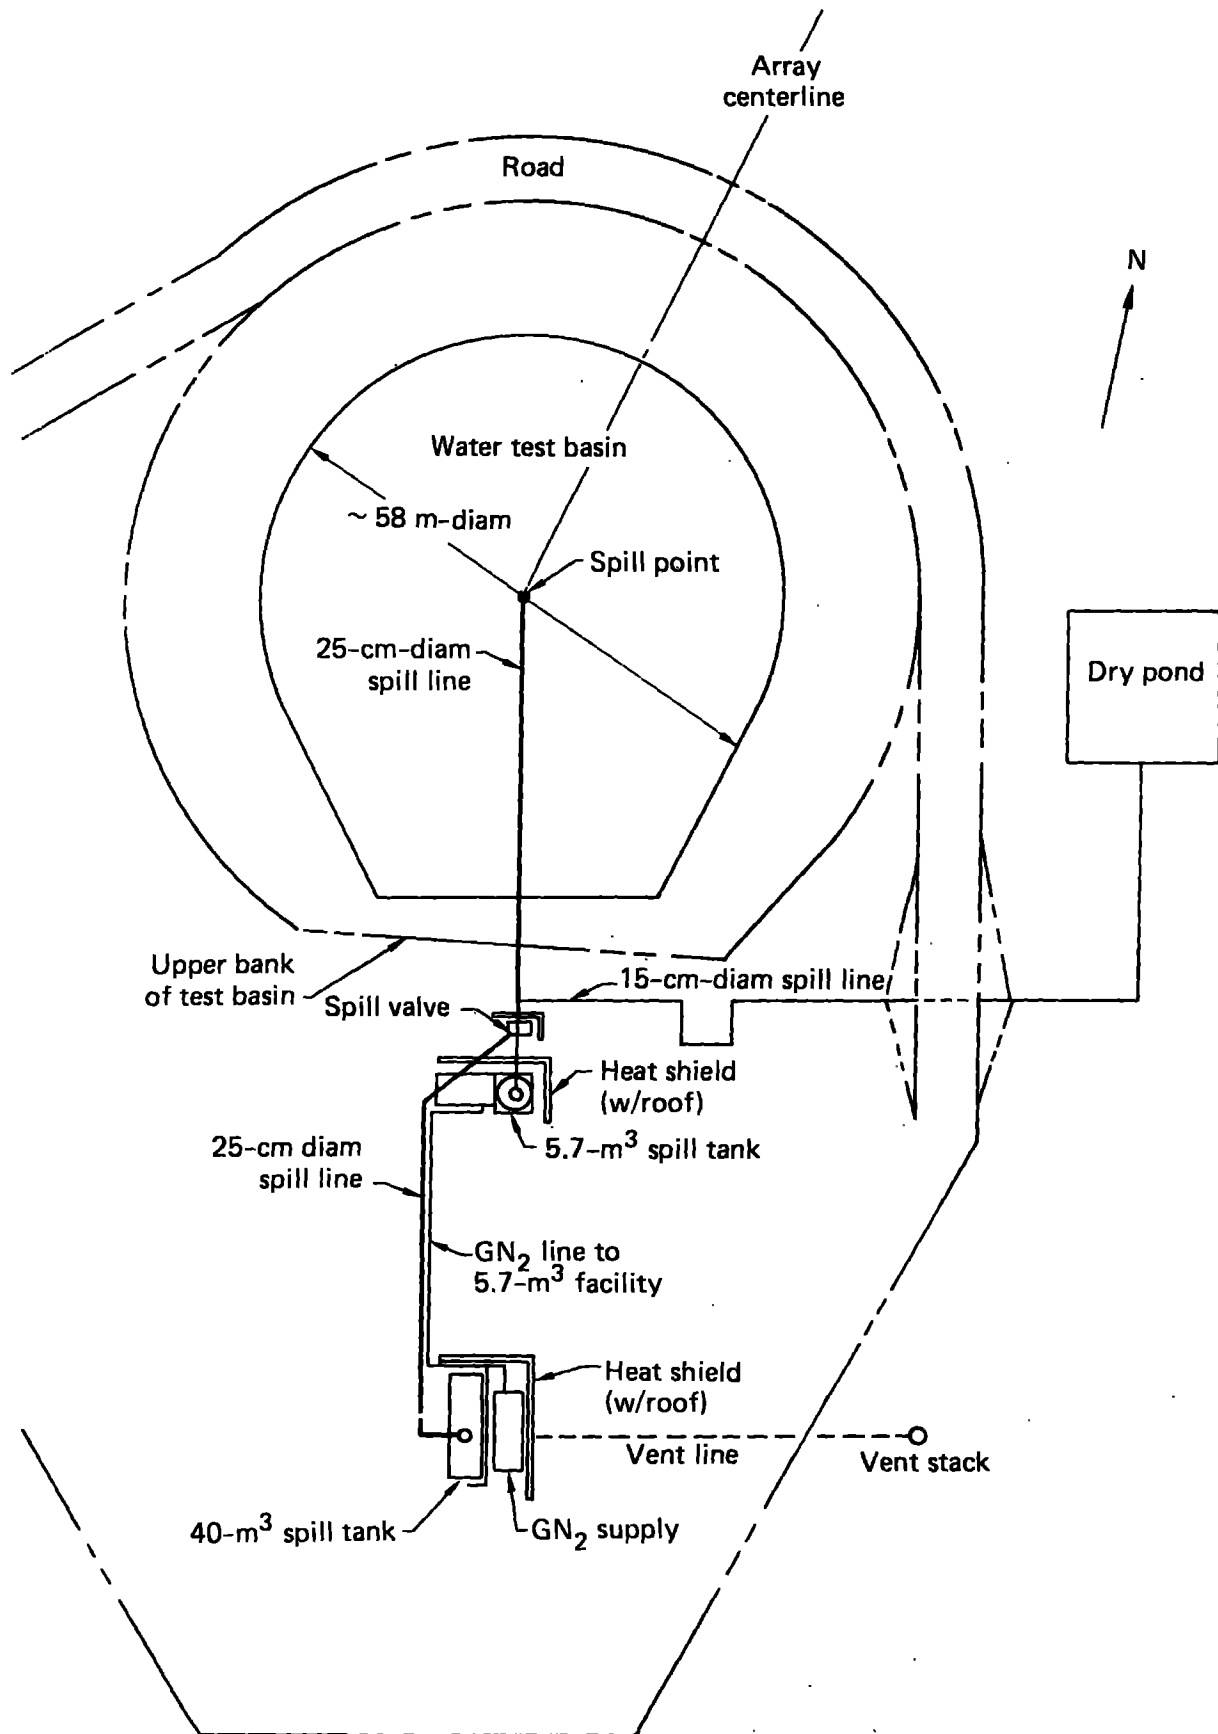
Site plan of Naval Weapons Center (NWC) spill facility at China Lake.
